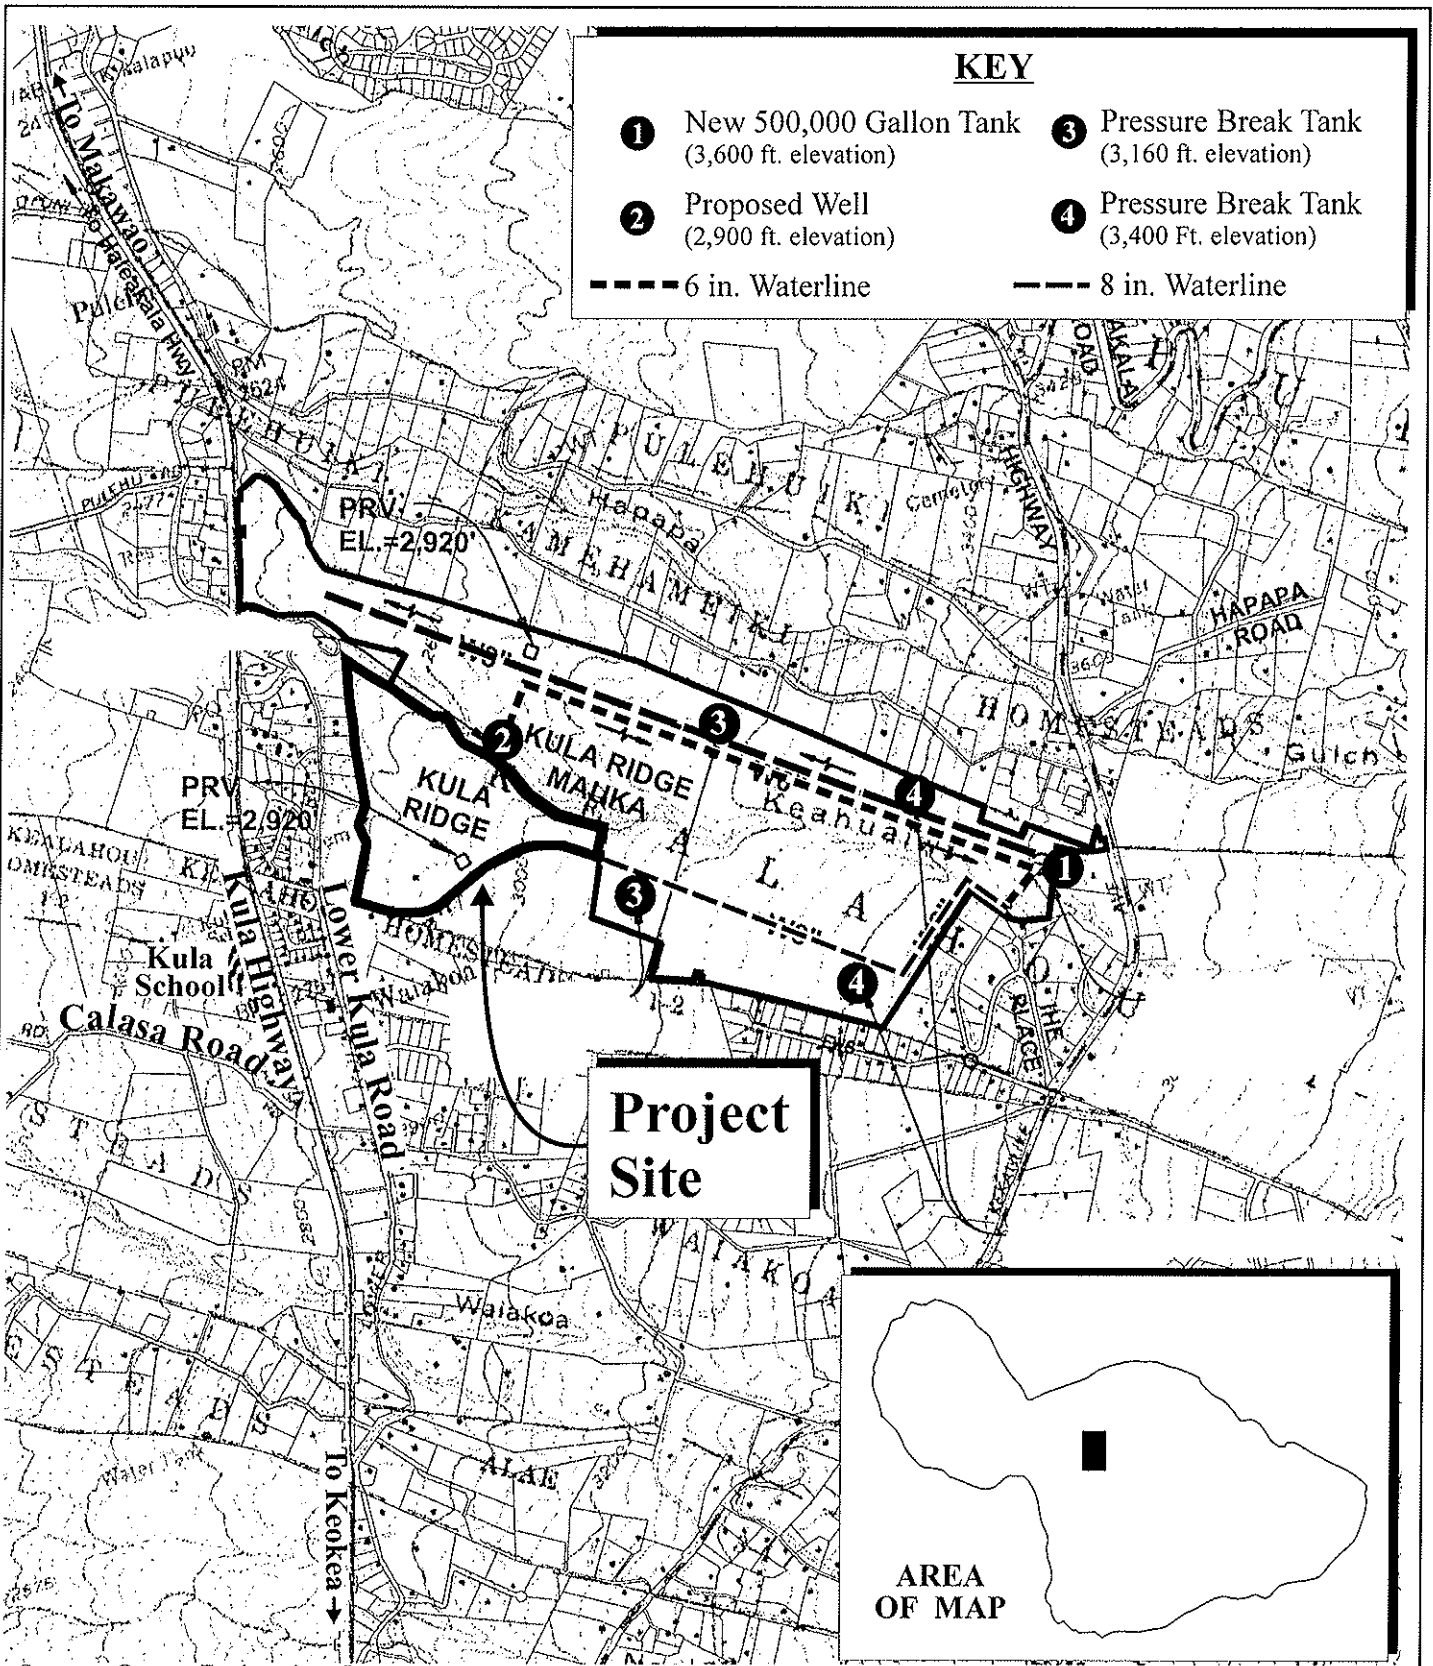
Proposed Kula Ridge Residential Workforce Housing Subdivision Proposed Water System
